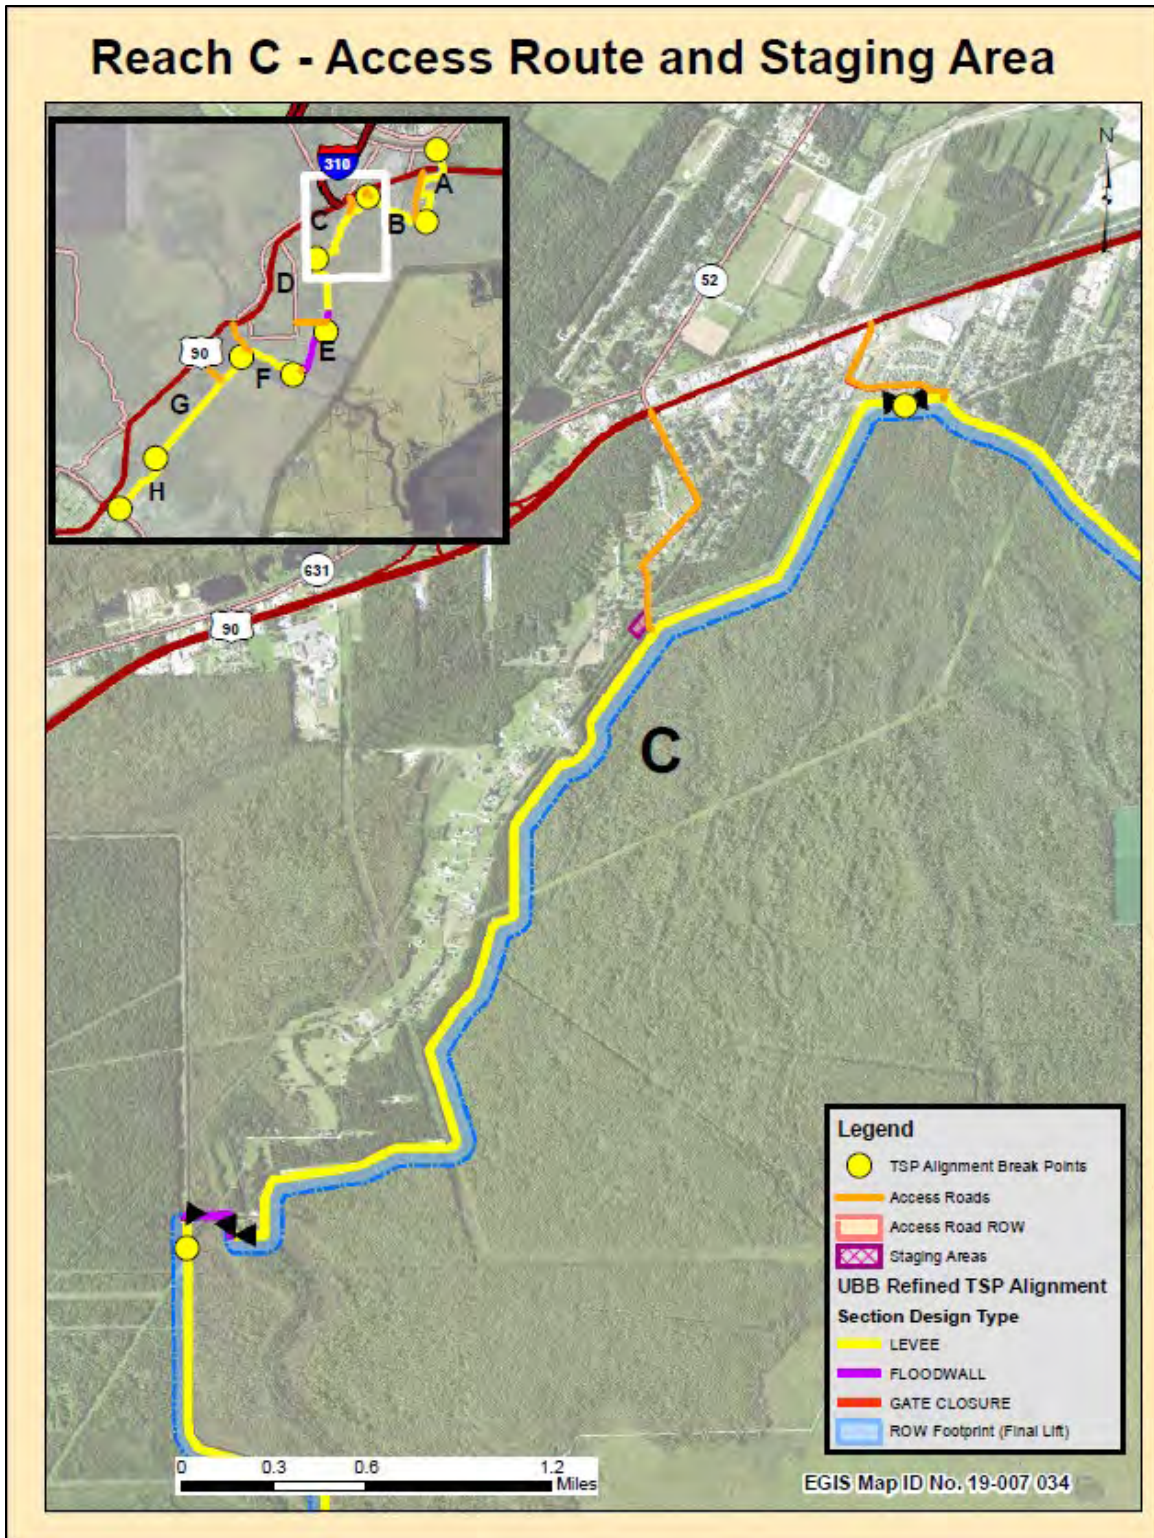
Hydraulic Reach C Access Road and Staging Area
